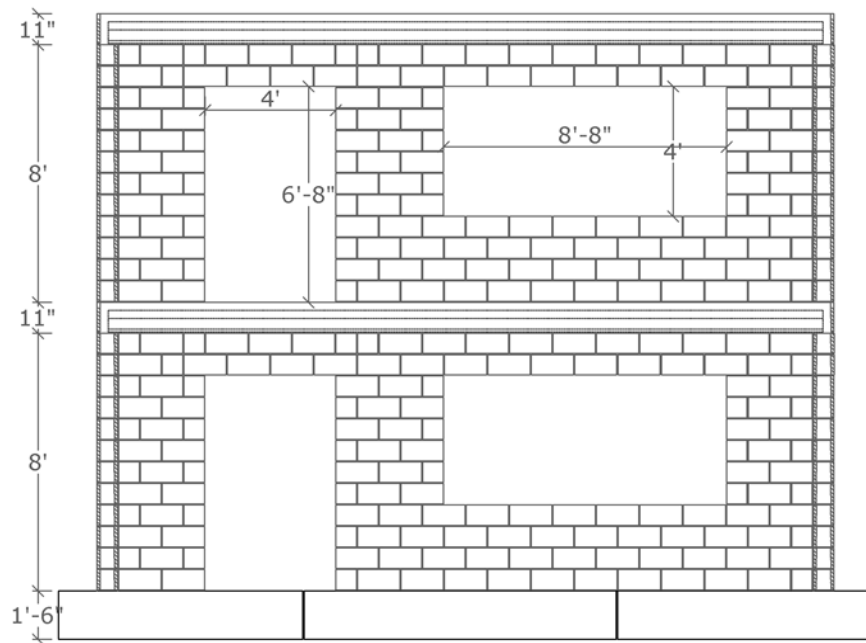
Elevation View of Web Wall Sections. Mavros, M. 2013. Personal Communication. Used under fair use, 2014.
